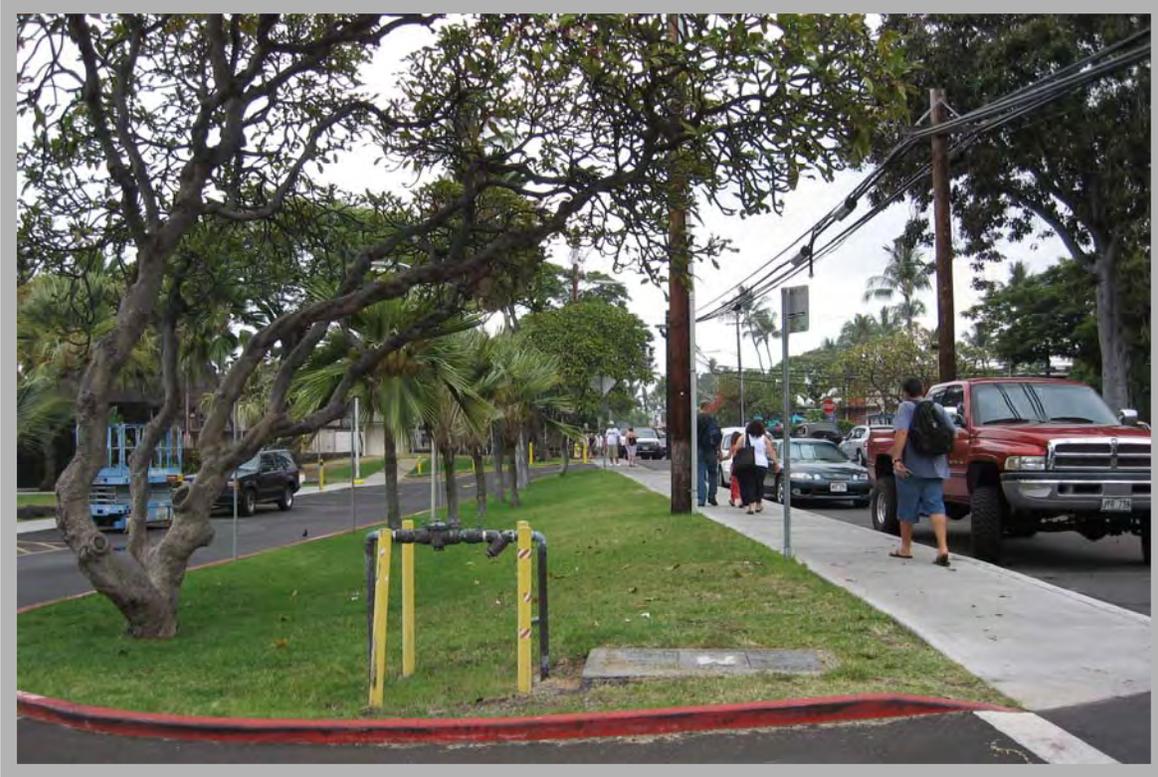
Fronting Hale Halawai – Center section (makai side, facing north).
